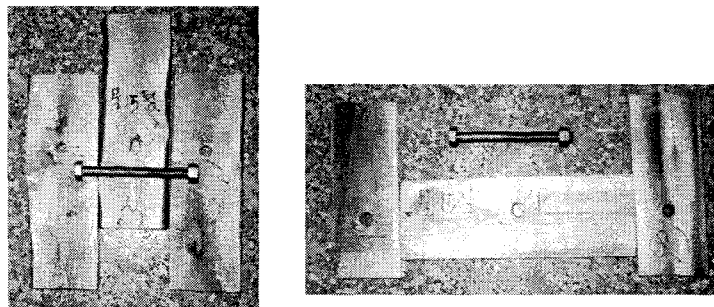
Failure modes for double shear bolted connections with hardwoods and 15.9mm bolts
